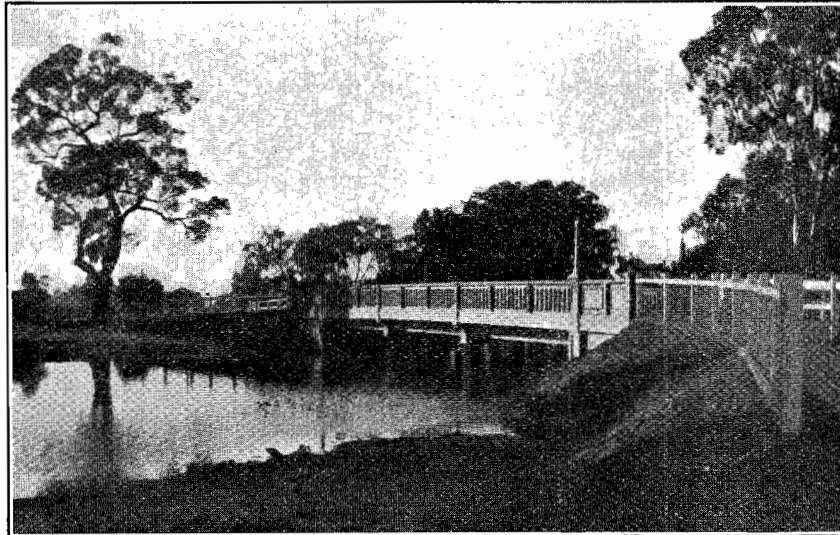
Bridge over Yarriambiack Creek, Warracknabeal.
